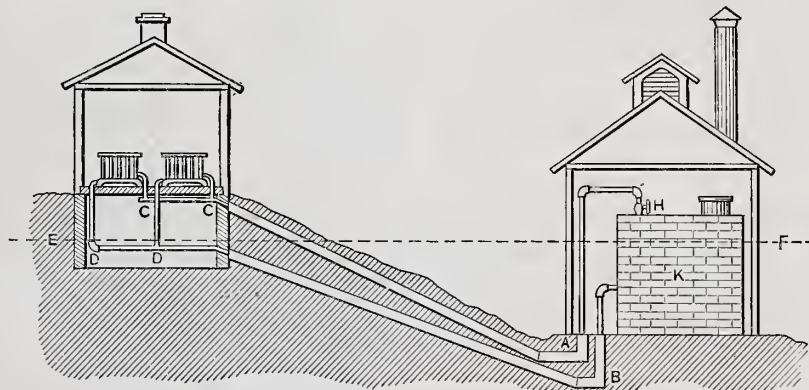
Arrangement of Supply and Return Pipes Between Boiler House and Building to be Heated.
